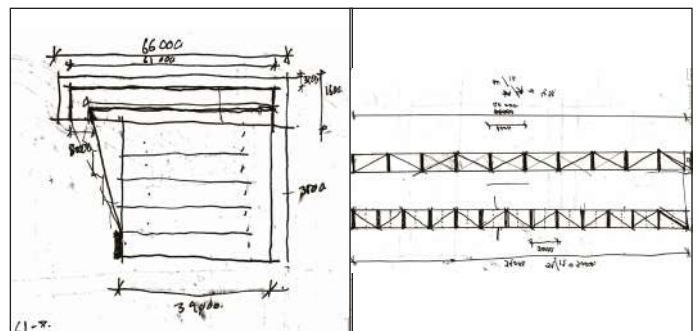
Connecting the roof structure to the grid spacing of the gym (Author: 2019)
